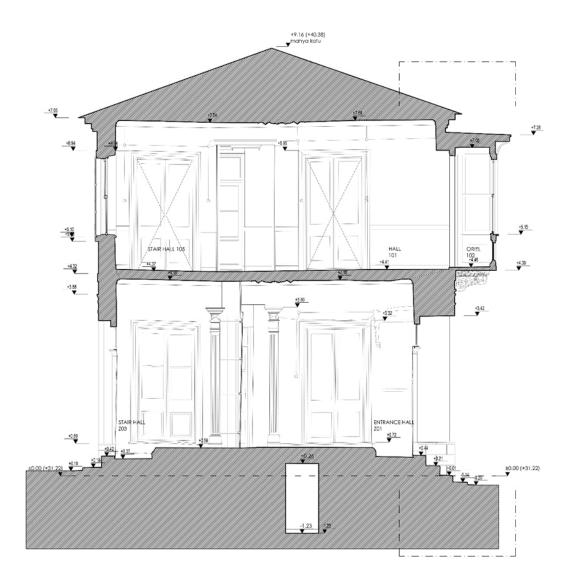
A-A section of the house in Basmane (Source: Düzalan and Açan, 2016)
